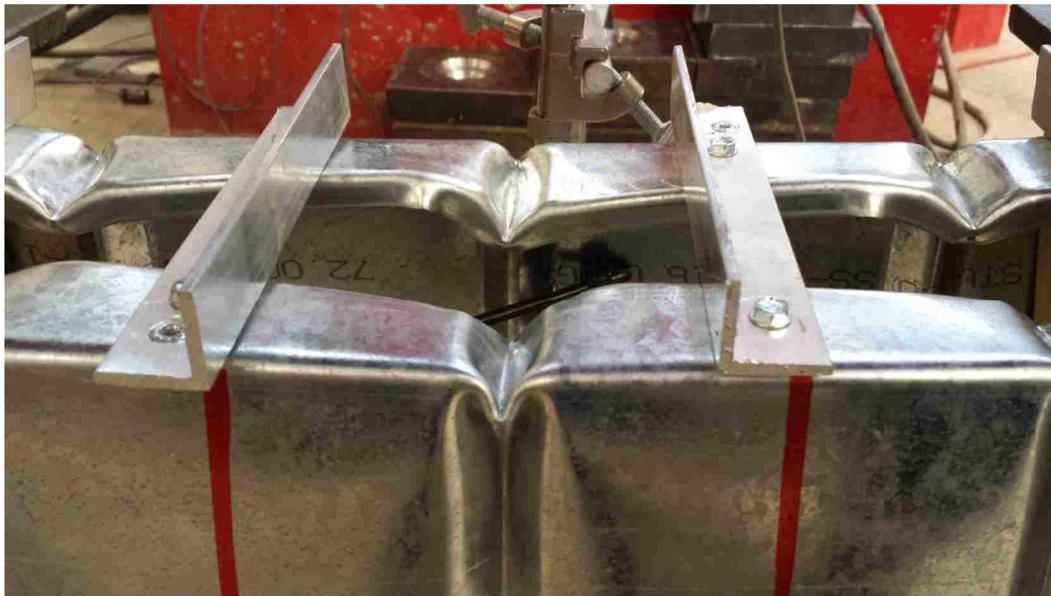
Typical Failure of Crimp in Compression Flange
